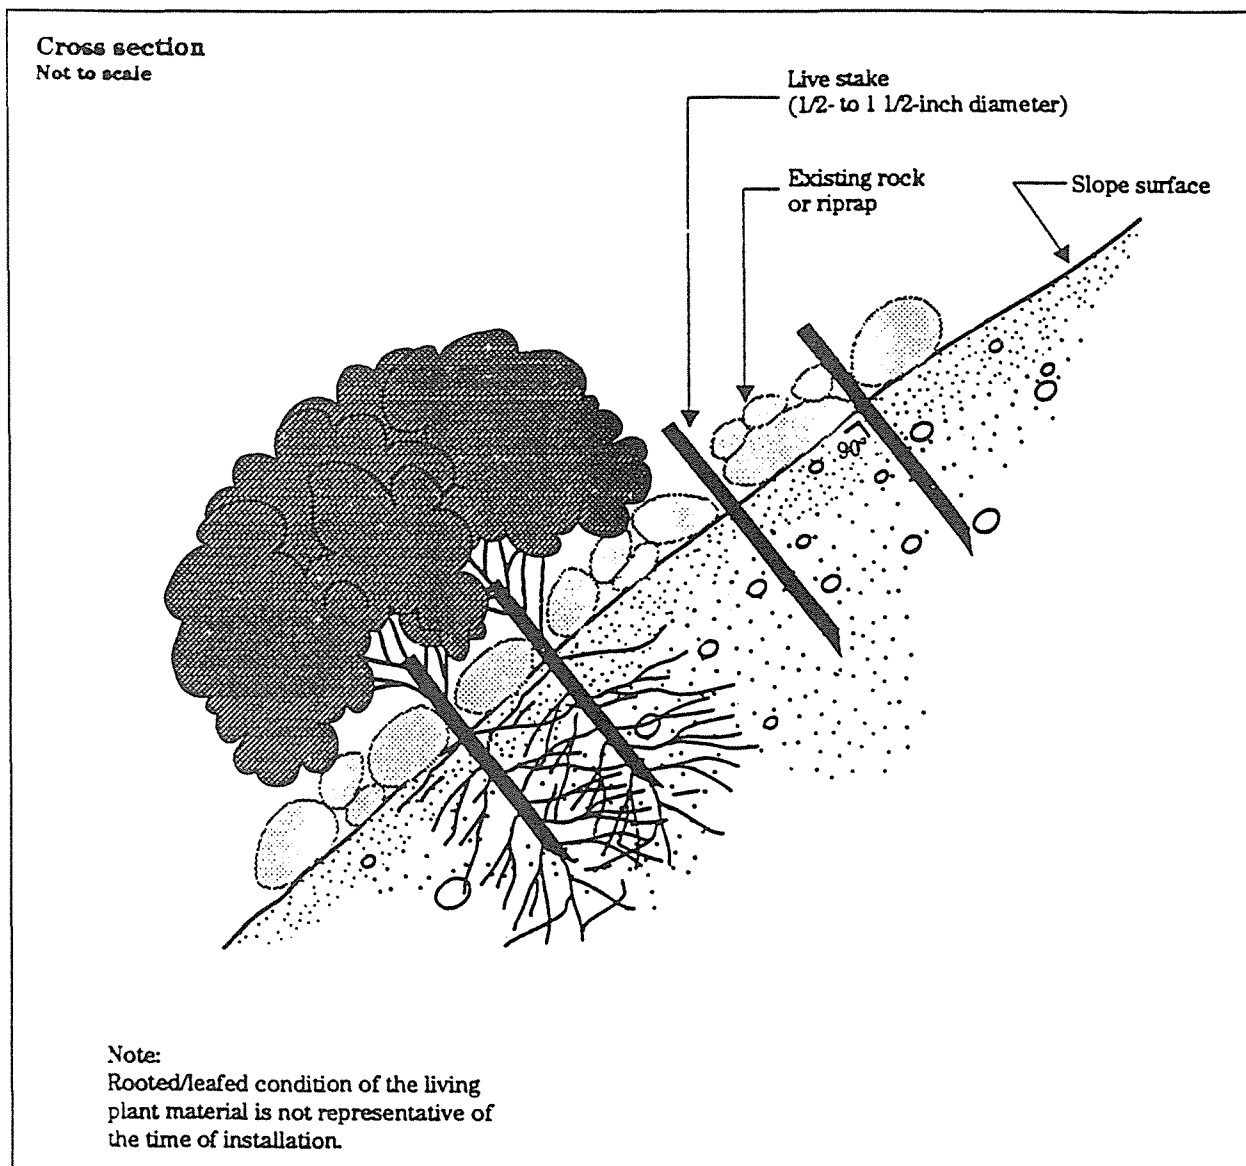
Schematic cross section of a joint planting system showing important design elements (USDA-SCS, 1992).
